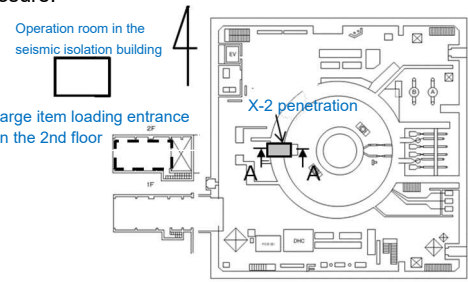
Location of X-2 penetration on the 1st floor of Unit 1 reactor building
